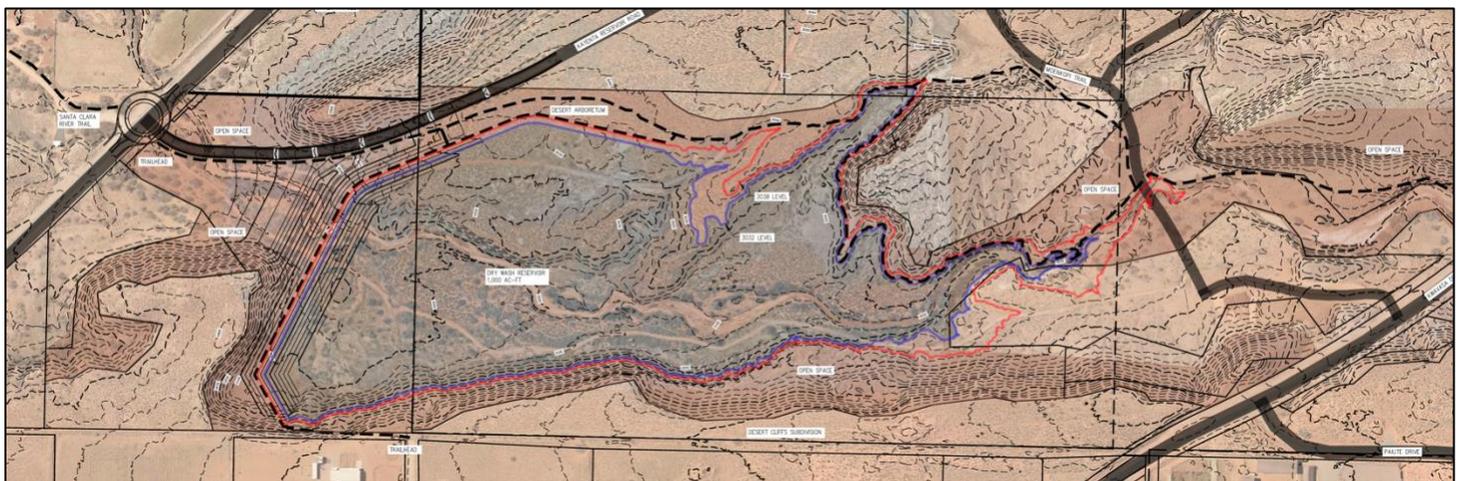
New proposal for the reservoir showing proposed open-space with trail system. The trail system (dashed black line) and open-space (darker brown shading) can be accessed from Kwavasa Drive, Old Hwy 91, and Center Street, making it readily available to all Ivins residents. The fetch within the exposed western slope is significantly reduced, and could be further minimized by establishing man-made levees that would break up the area into smaller sub-basins.
